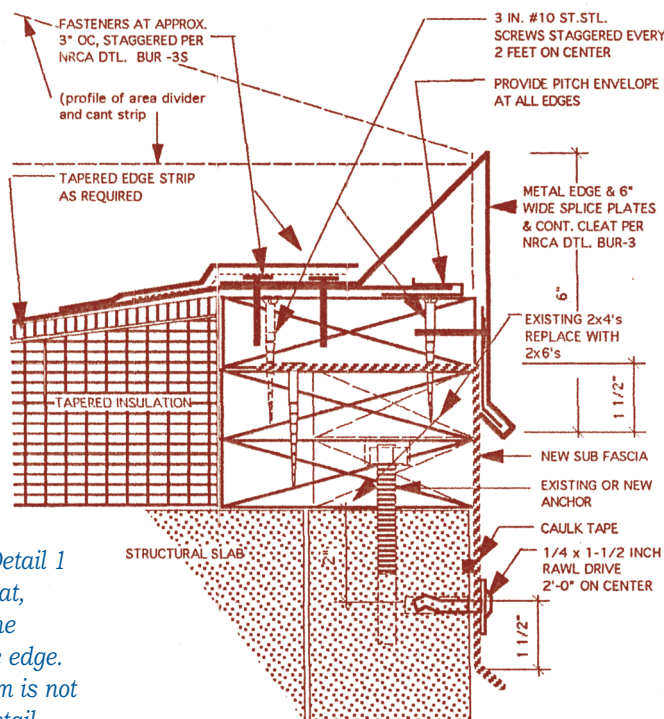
Consultant Detail 1 describes the conditions that, along with the roof, form the building components at the edge. Note that the roofing system is not described in detail. This detail does reference NRCA detail BUR-3 (Illustration 2 above).
